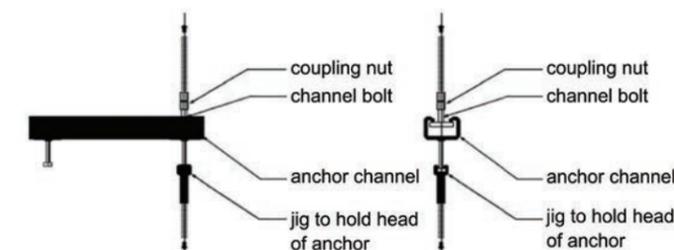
Tension test setup for testing anchor channels in a universal testing machine. (Figure taken from AC232, Figure 5.5).
